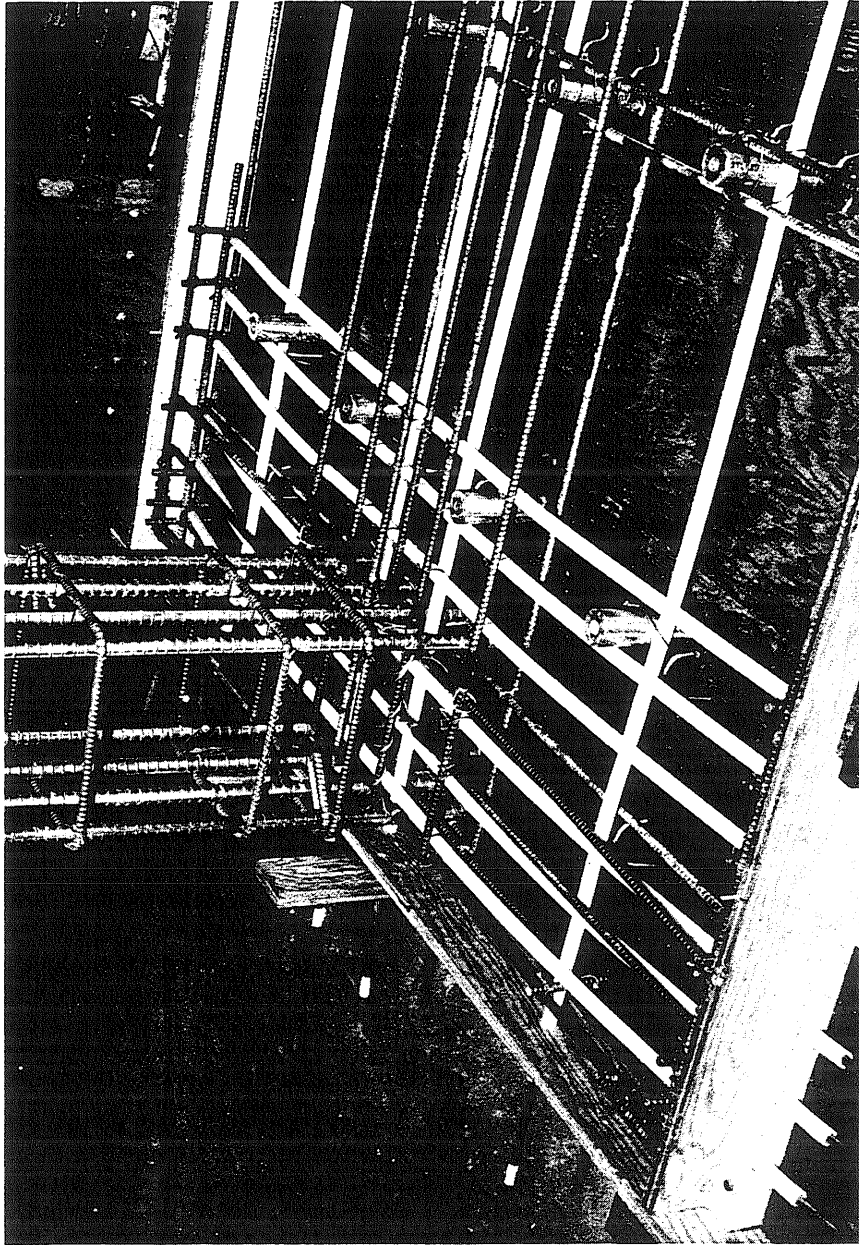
Arrangement of Reinforcement of Specimens S3 and S4
